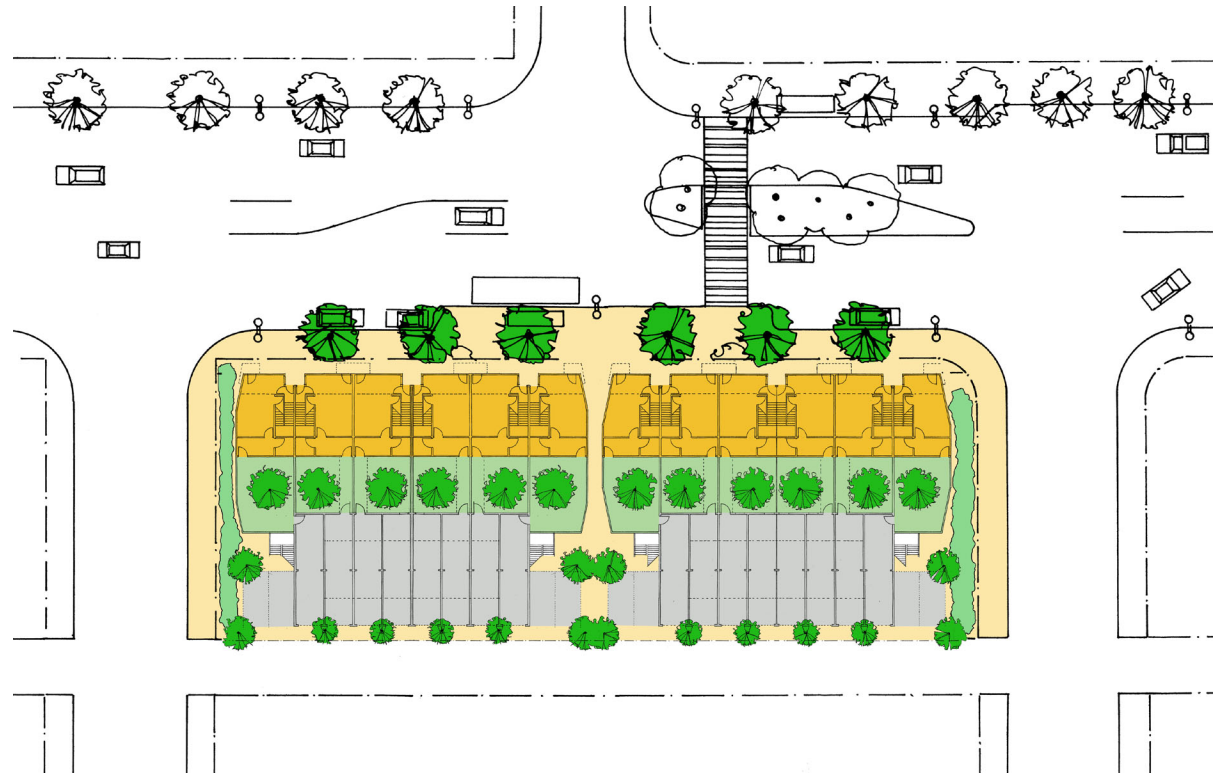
Site plan for live-work townhouses in East Garvey.
